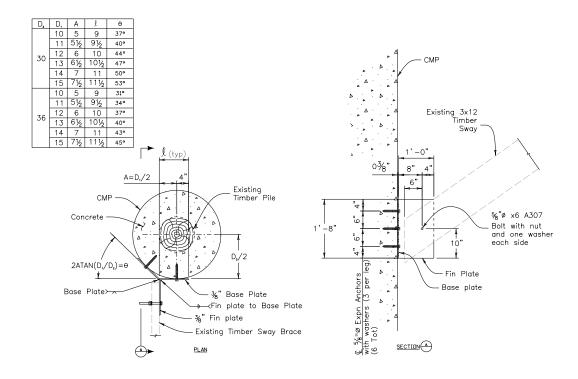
(G)-3 Sample Detail of Timber Pile Repair and Bracing
